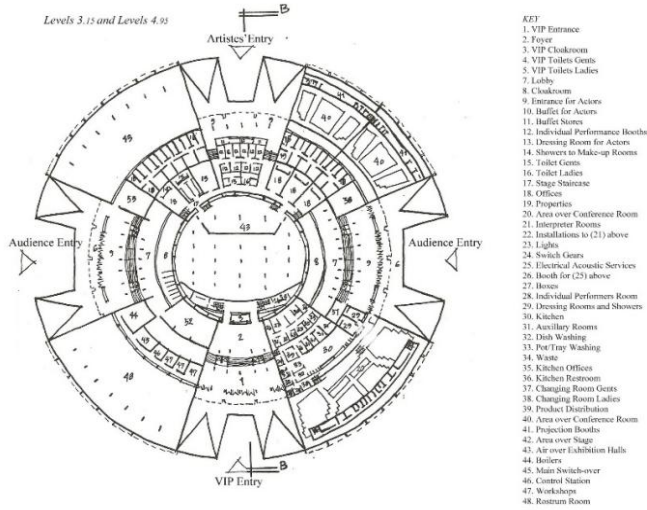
Level 3.15 and 4.95 Layout Floor Plans of the National Theatre, Museum
